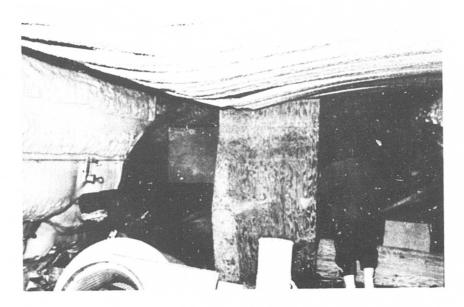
Metal roof arch deformation and snow encroachment upon Jamesway (Trench 10).
